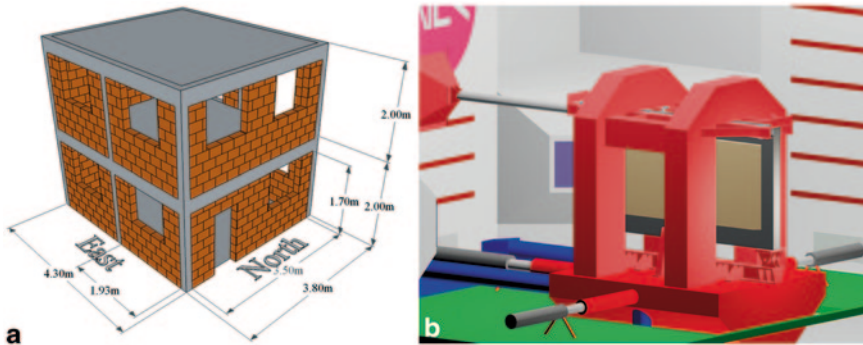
Schematic representation of a building model, b wall panels' test setup
